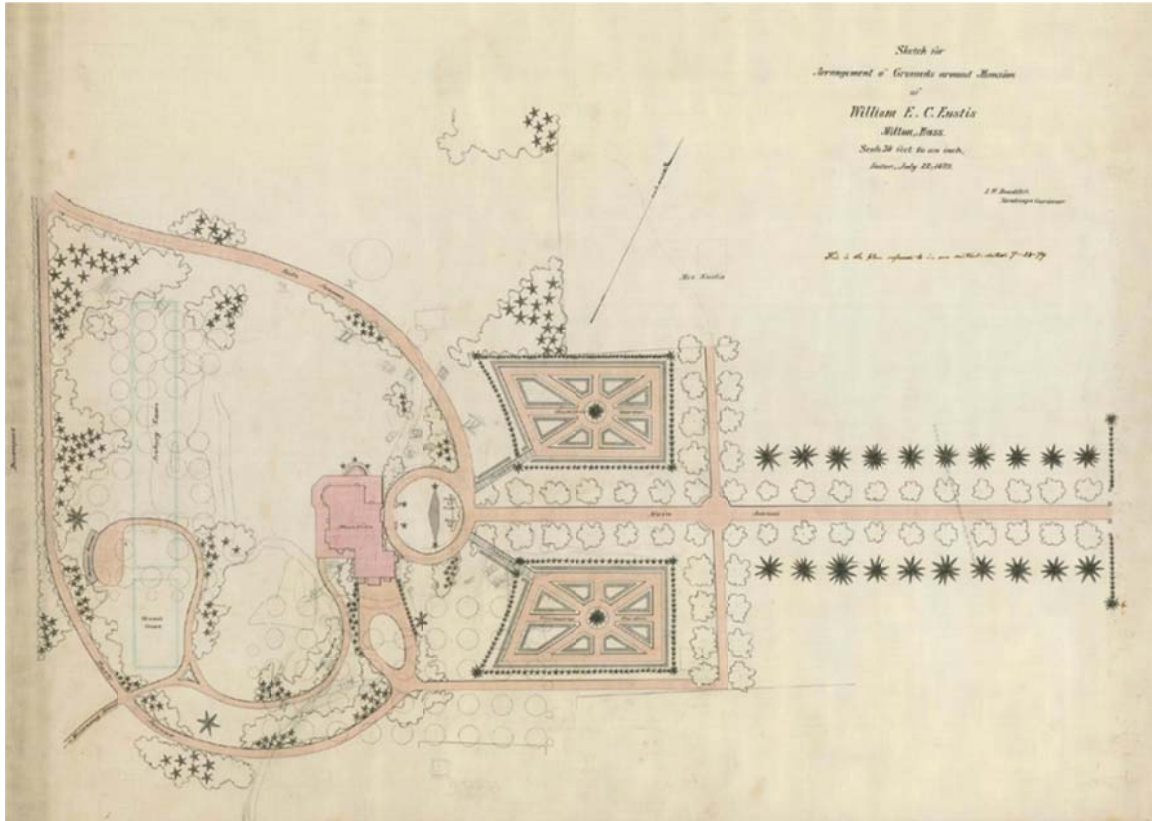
1879 Bowditch Plan (Source: Historic New England, Inc.)
